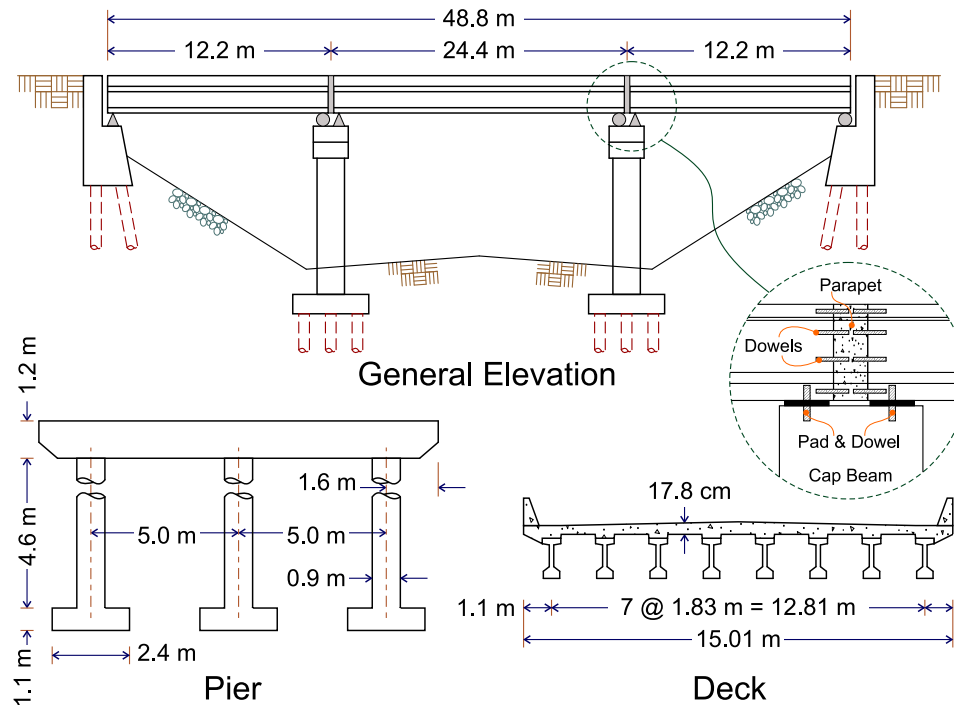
MSC Concrete Girder Bridge Configuration.
